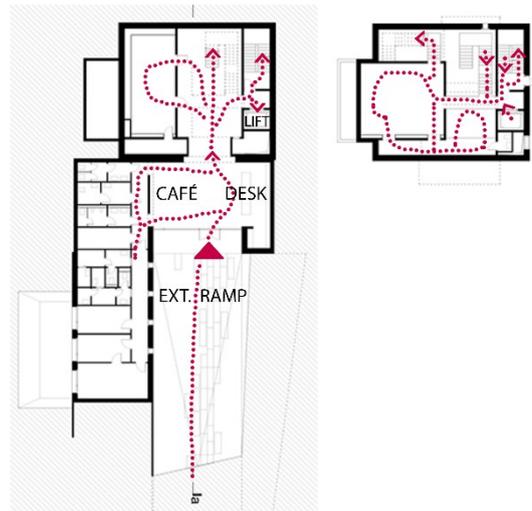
Kemes Volcano Park, Hungary: Floor plans. (Source: Floor plans by Foldes Architects with markings by Filová, 2021)
